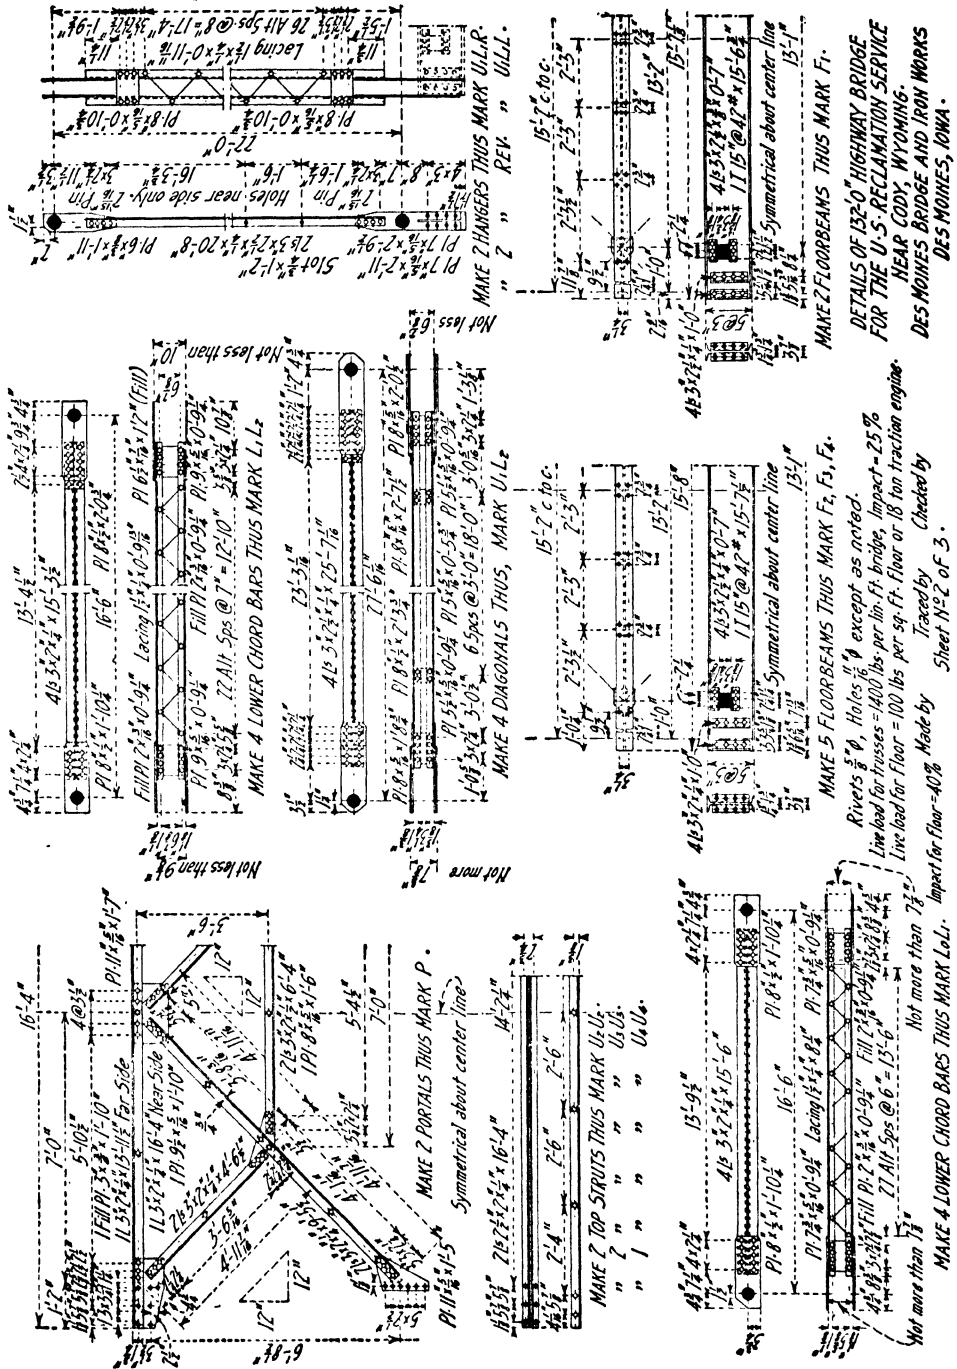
DETAILS OF A PIN-CONNECTED HIGHWAY BRIDGE.
